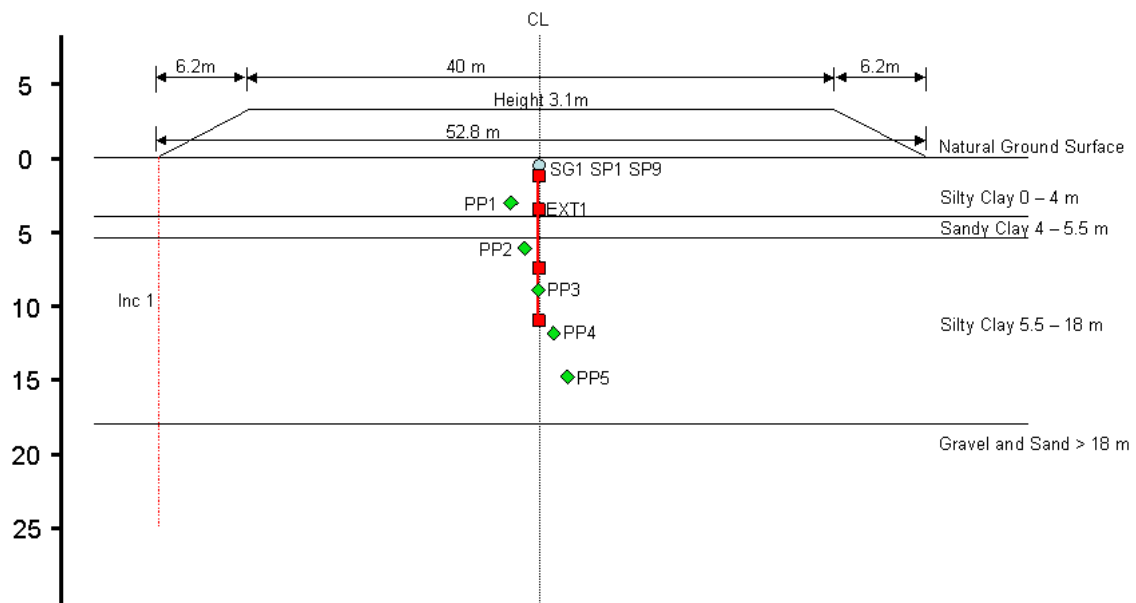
Embankment A CH790 –CH950: Cross Section Showing Instrumentation
